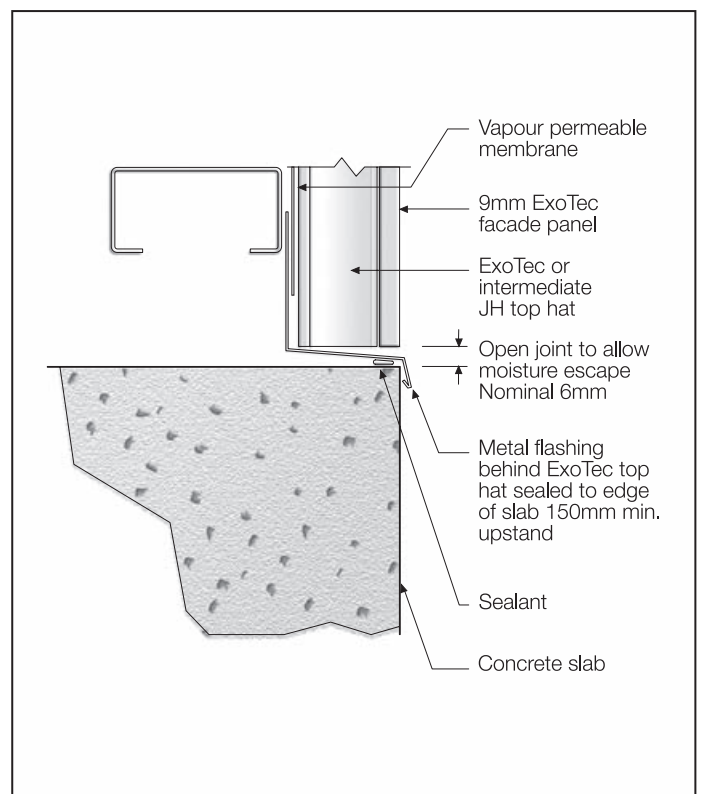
WALL BASE TYPICAL DETAIL 2
